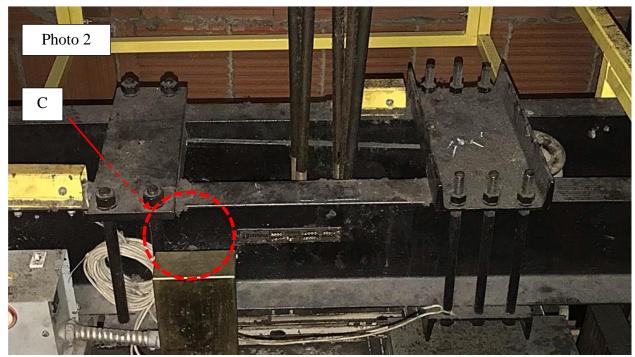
Overview of spring hitch arrangement [C] Area where spring hitch is located - between crosshead members (not visible in photo)
